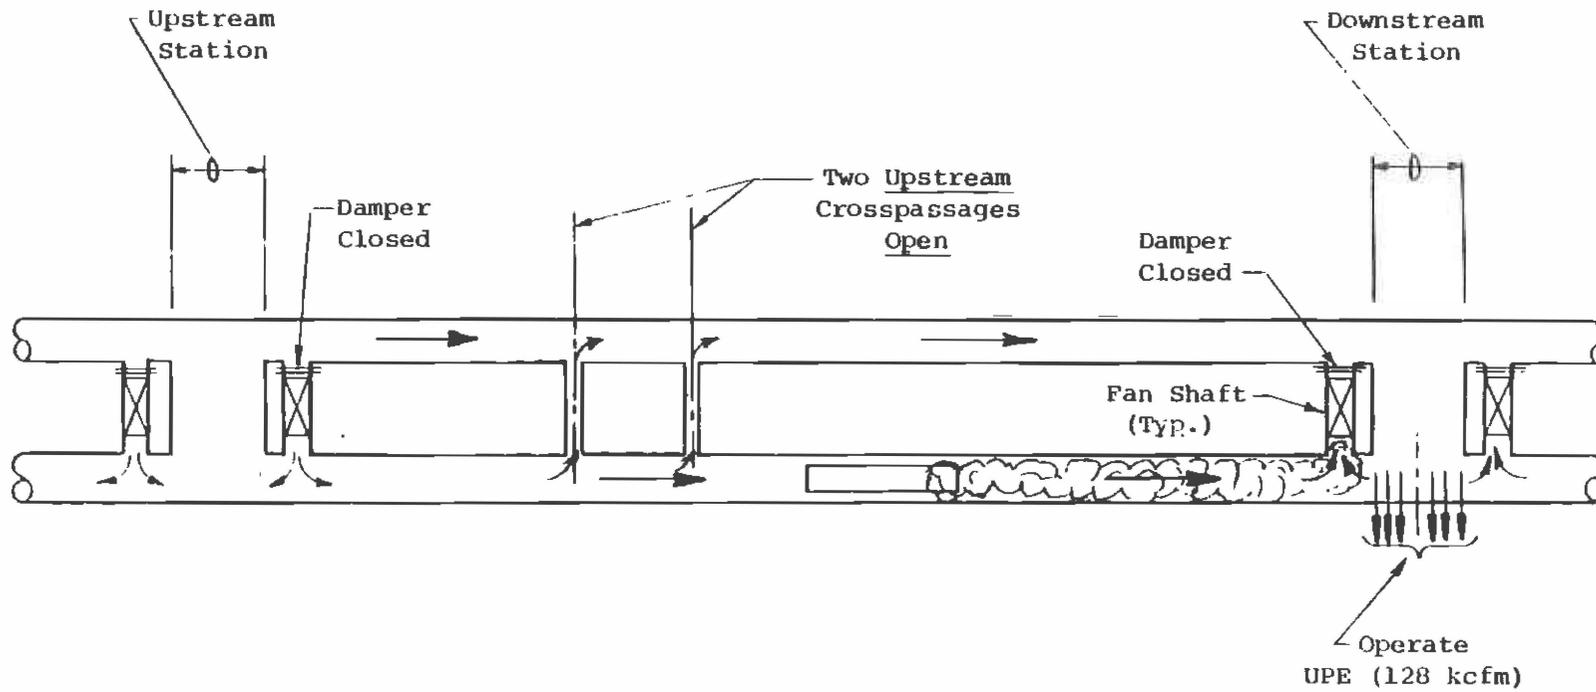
Emergency Ventilation Concept for a Typical Tunnel Section
